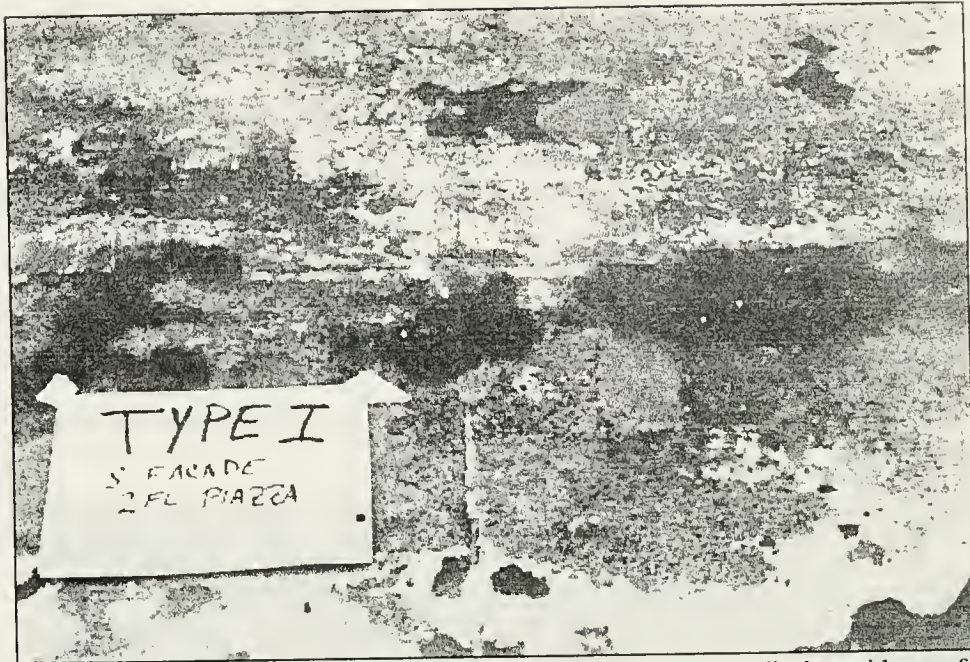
Example of stucco type 1. Though intact, certain areas display evidence of surface discoloration and detachment of surface finishes. South facade, second floor piazza.
